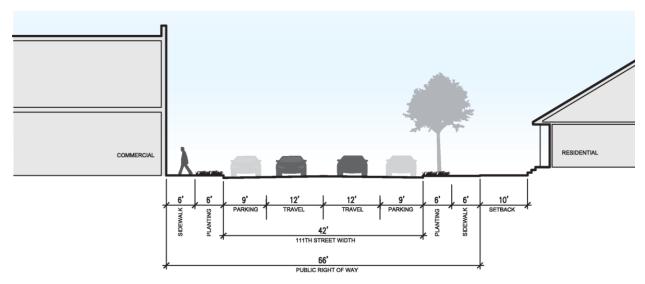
Typical section along 111th Street on the 500 West block between Parnell Avenue and Normal Avenue
